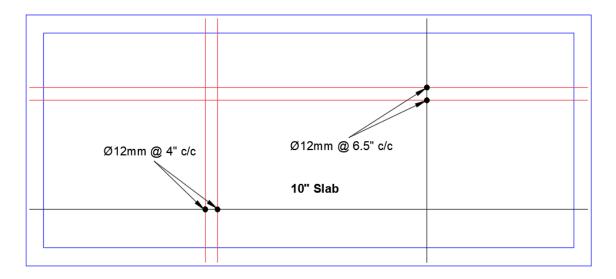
Reinforcement details of top slab of the underground water reservoir.
